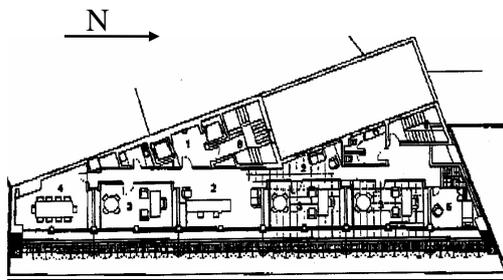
Cross-section of a typical floor plan of the AVAX building
